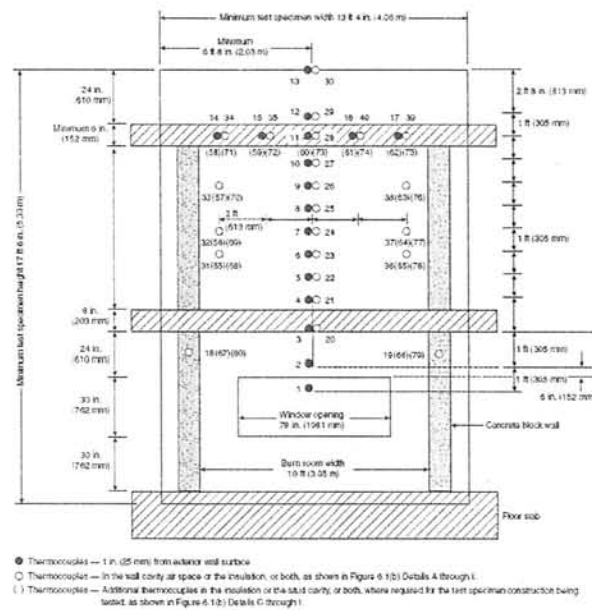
(a) From View of Test Specimen Superimposed over Test Apparatus Thermocouple Locations.
